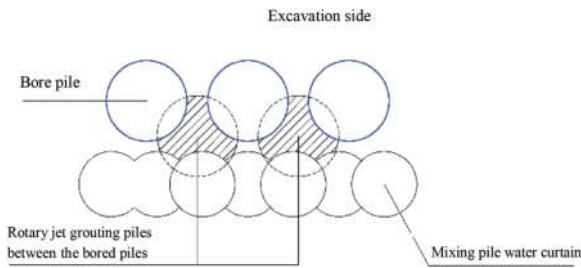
Schematic diagram of bored pile, mixing pile water curtain, and rotary jet grouting pile.
